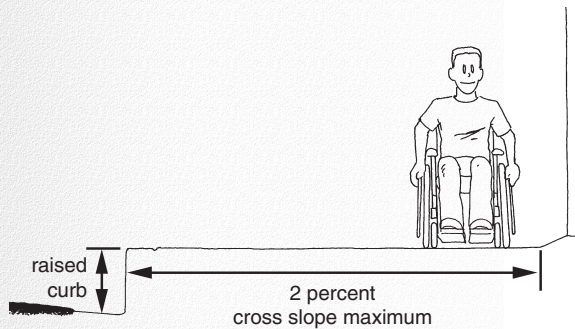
ACCEPTABLE DESIGN: Increasing the height of the curb provides a level pathway when the street elevation is lower than the building elevation. This solution is not ideal because it is more difficult to install well-designed curb ramps at corners with high curbs.
